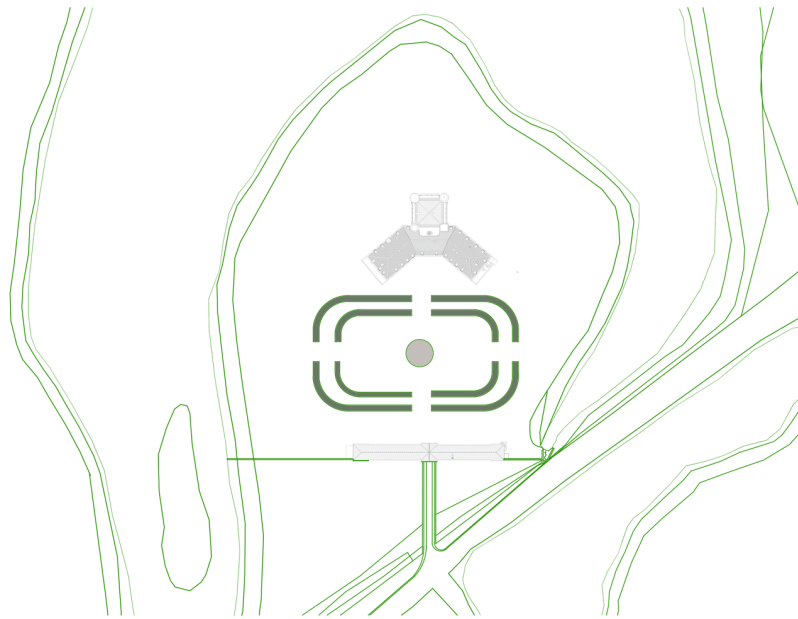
Re-proposal of the floor plan for Pietro's project n.3 Porcinai. Source: Pietro Porcinai Archive. Graphic rework
